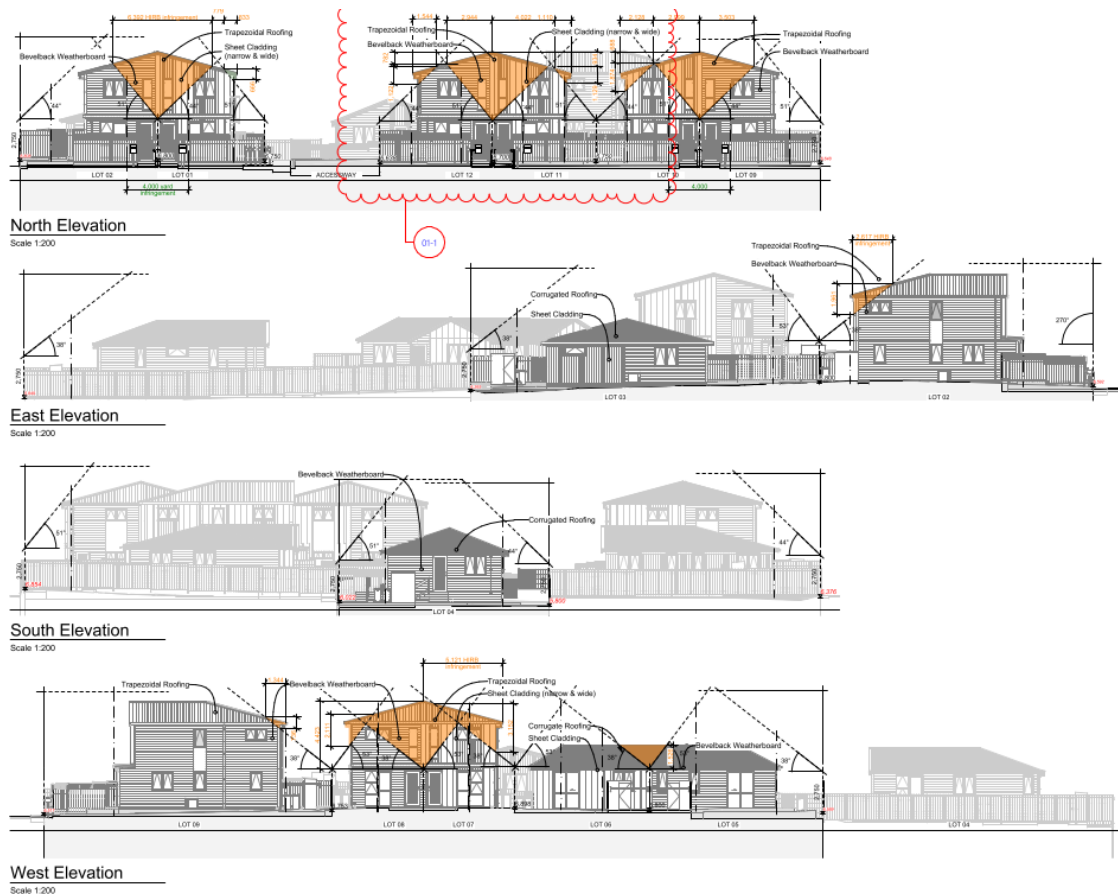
Elevations; orange indicates height recession plane infringements on boundaries. Some are duplex boundaries and so not applicable. Yard infringements not shown.
